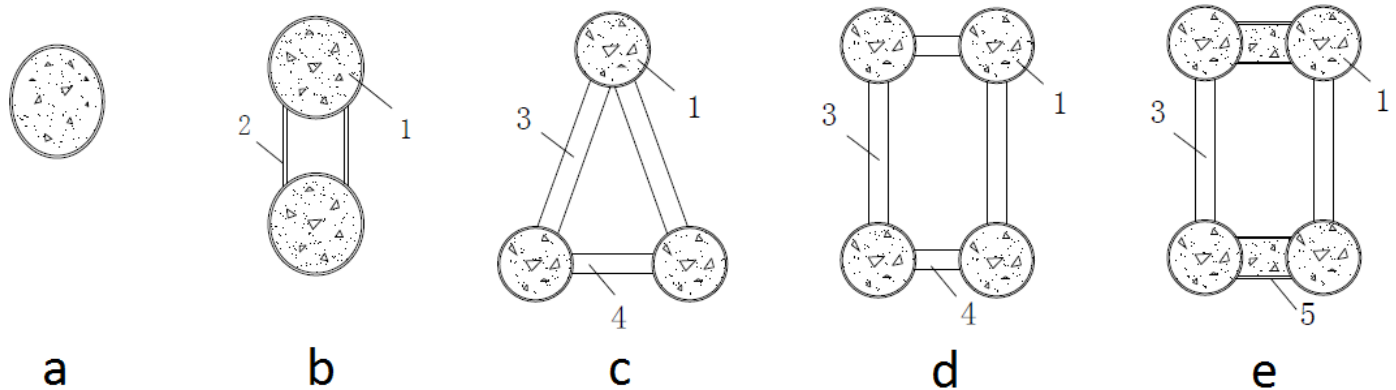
a) Single tube section b) Dumbbell Section c) Three-chord truss section d) Four-chord truss section e) Horizontal dumbbell truss
